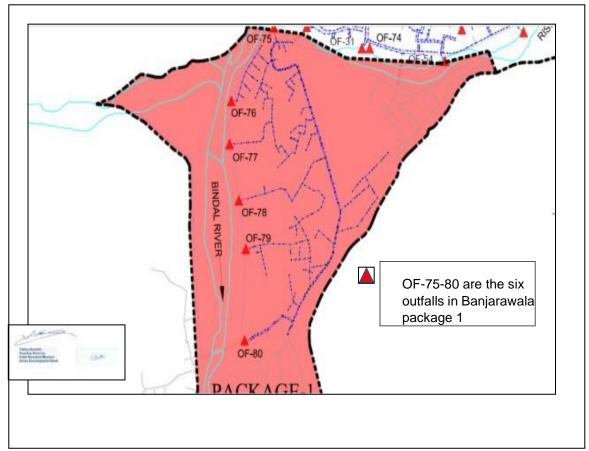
Proposed Stormwater drains and Outfall map in Banjarawala Package 1
